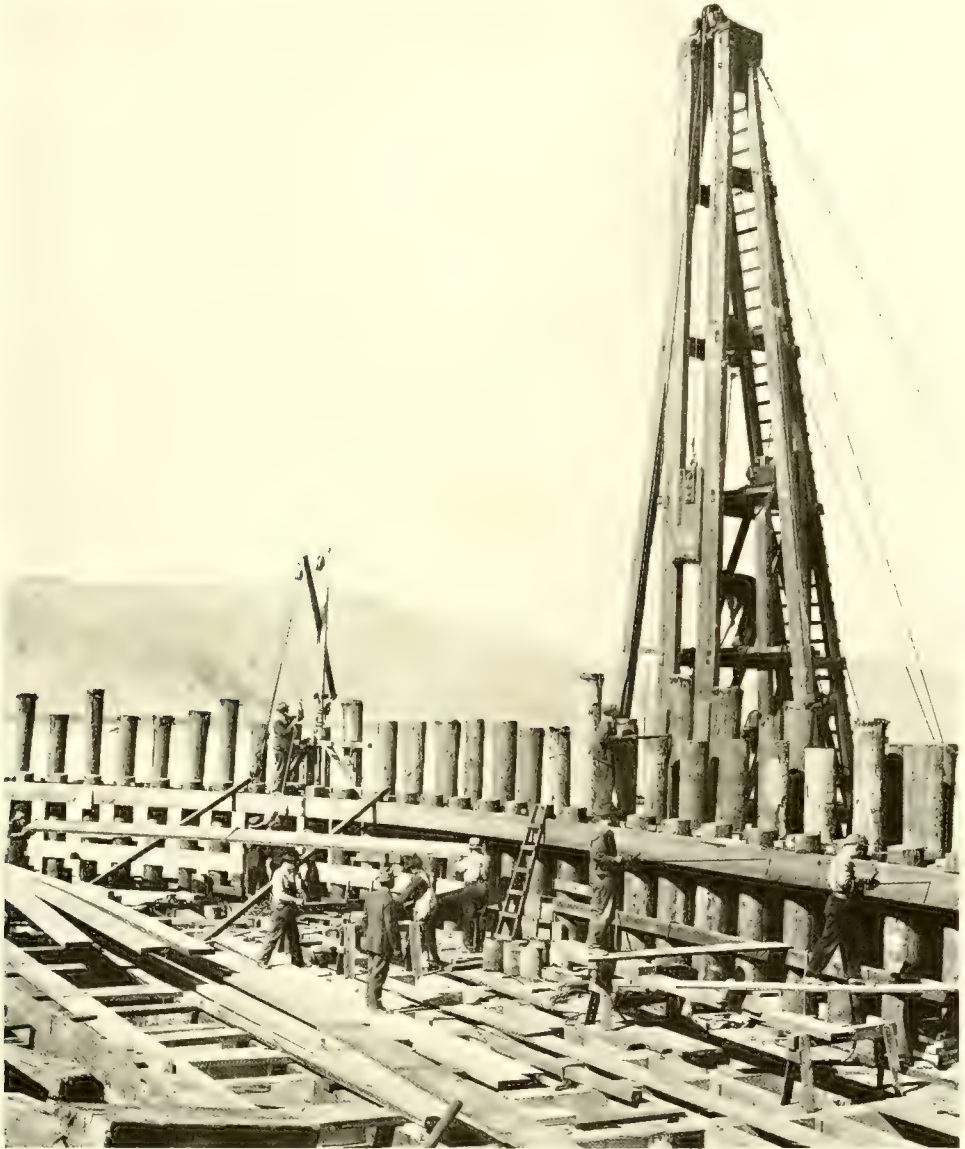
Driving creosoted piling. Note cap on pile under hammer to avoid splitting.
